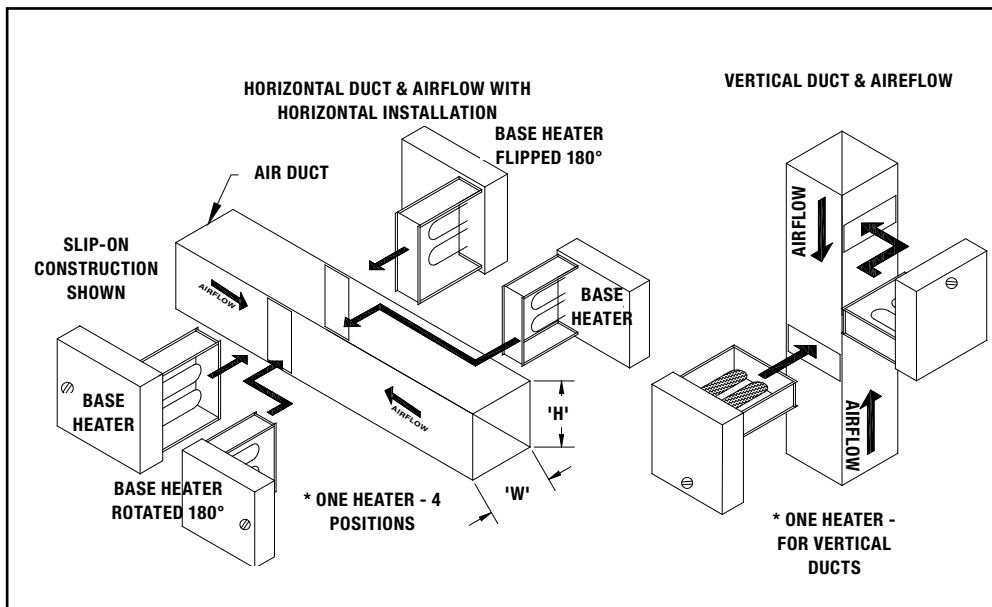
COMMON INSTALLATION APPROACHES
